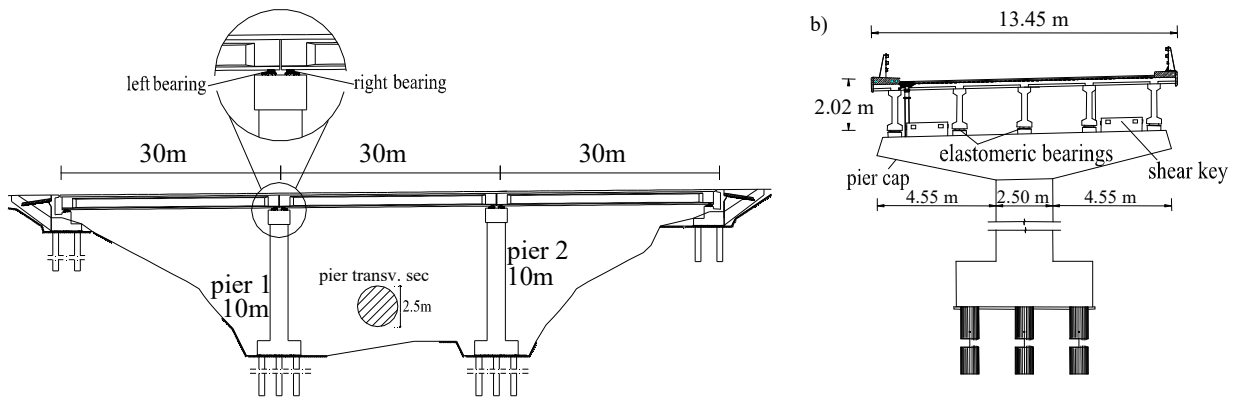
a) Bridge elevation and b) deck section at midspan.
